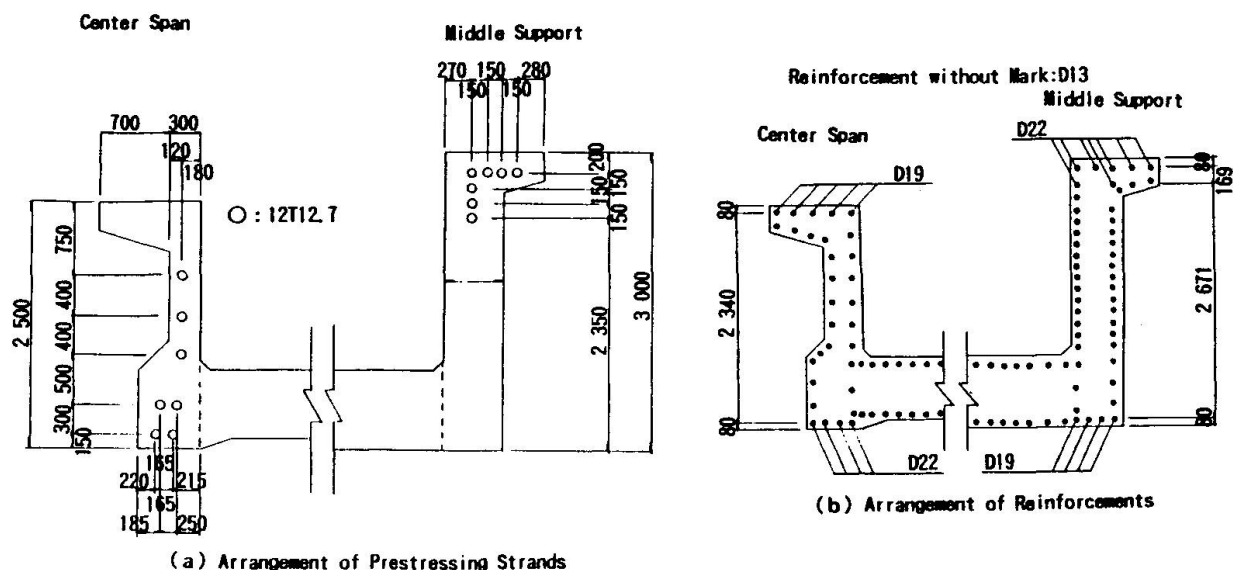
Arrangements of Prestressing Strands and Reinforcements
